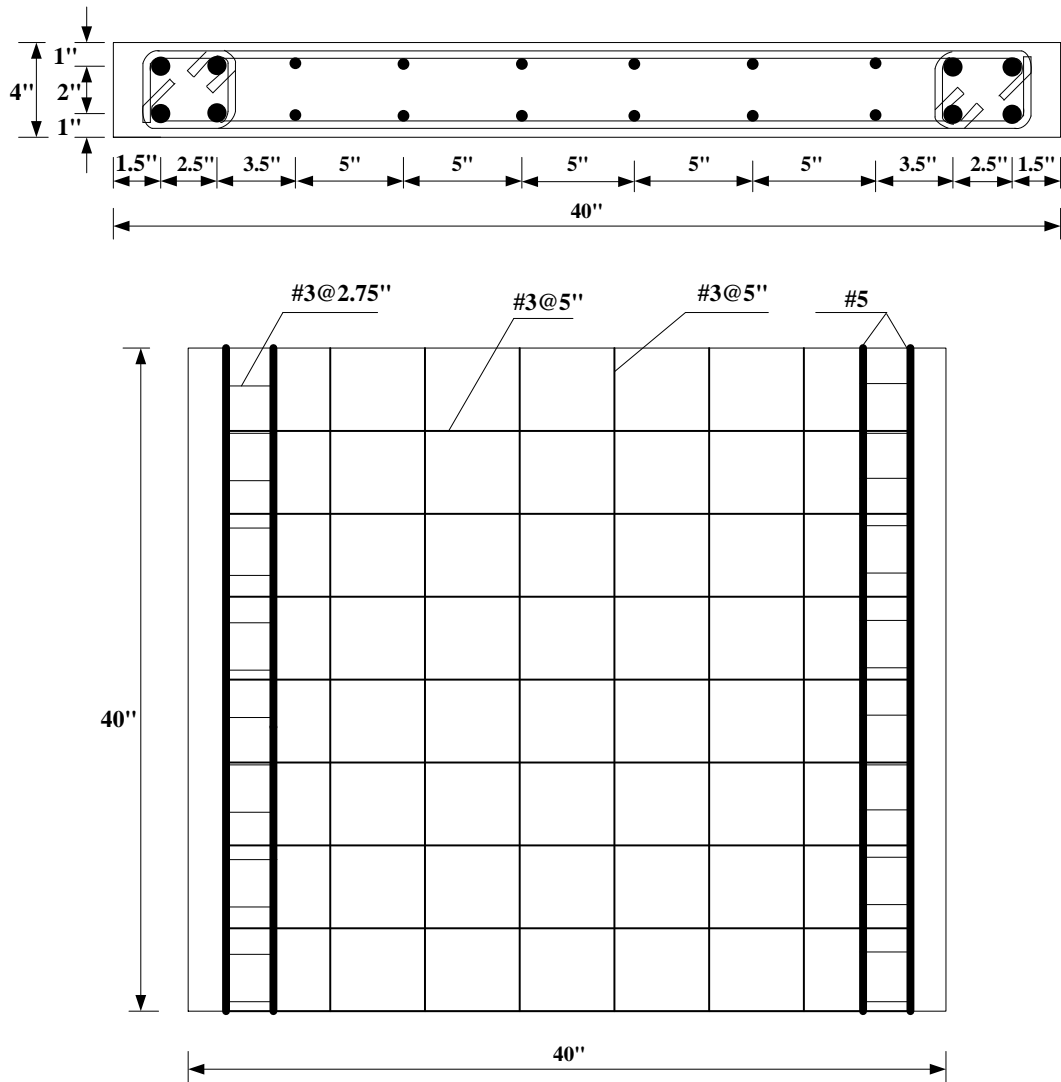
Reinforcement layout for specimen SW-MA-1.0
